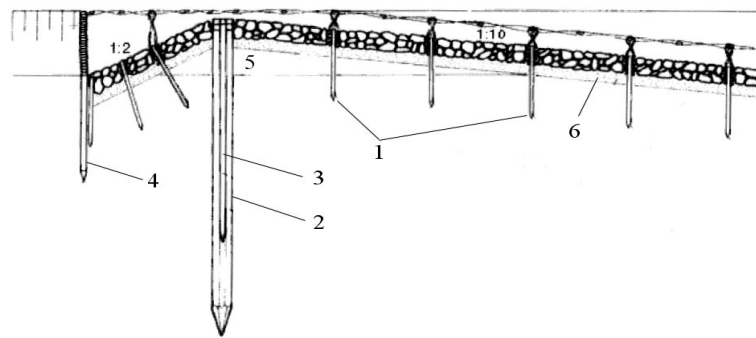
A cross-section of a sill connected with rifle-type fish passes. 1 – a bundle of wooden pins (1 m length), 2 – wooden wall, 3 – pales (0.2 m diameter), 4 – wooden pegs (1.3 m length), 5 – clay, 6 – gabion mat. Figure by Stepaniuk.
